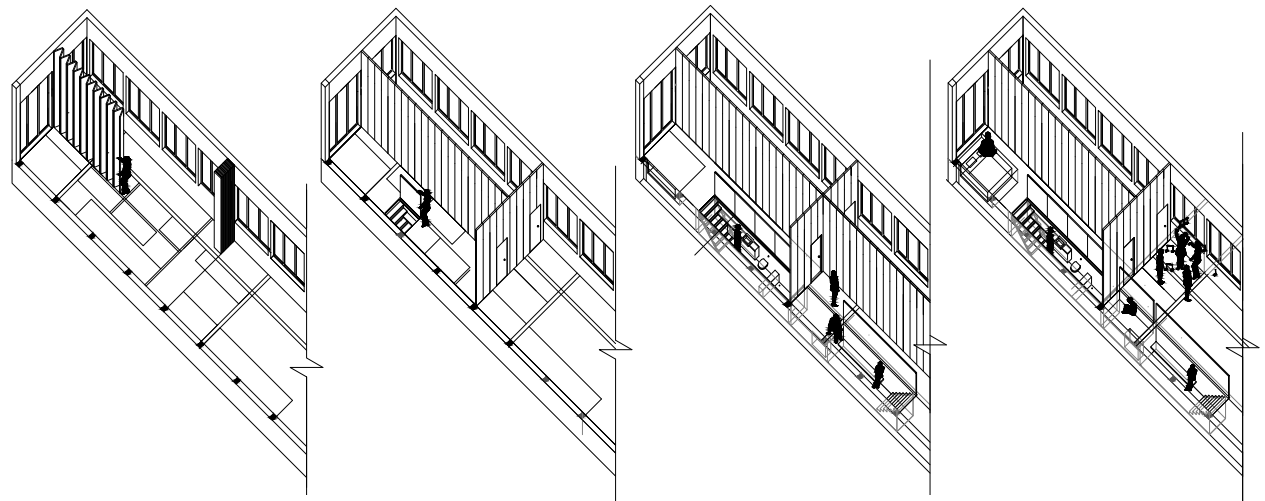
Sectional 3D of *The Suitcase House*. *The Suitcase House* is elevated off the ground allowing service hatches to be accessed below the floor level.
